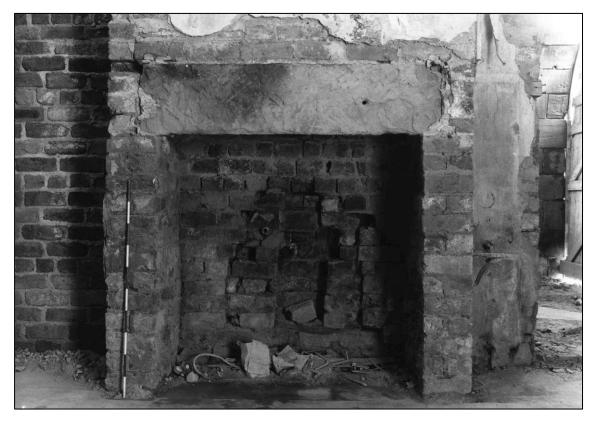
Fireplace in south wall of central room, looking S (photo 2/10).
